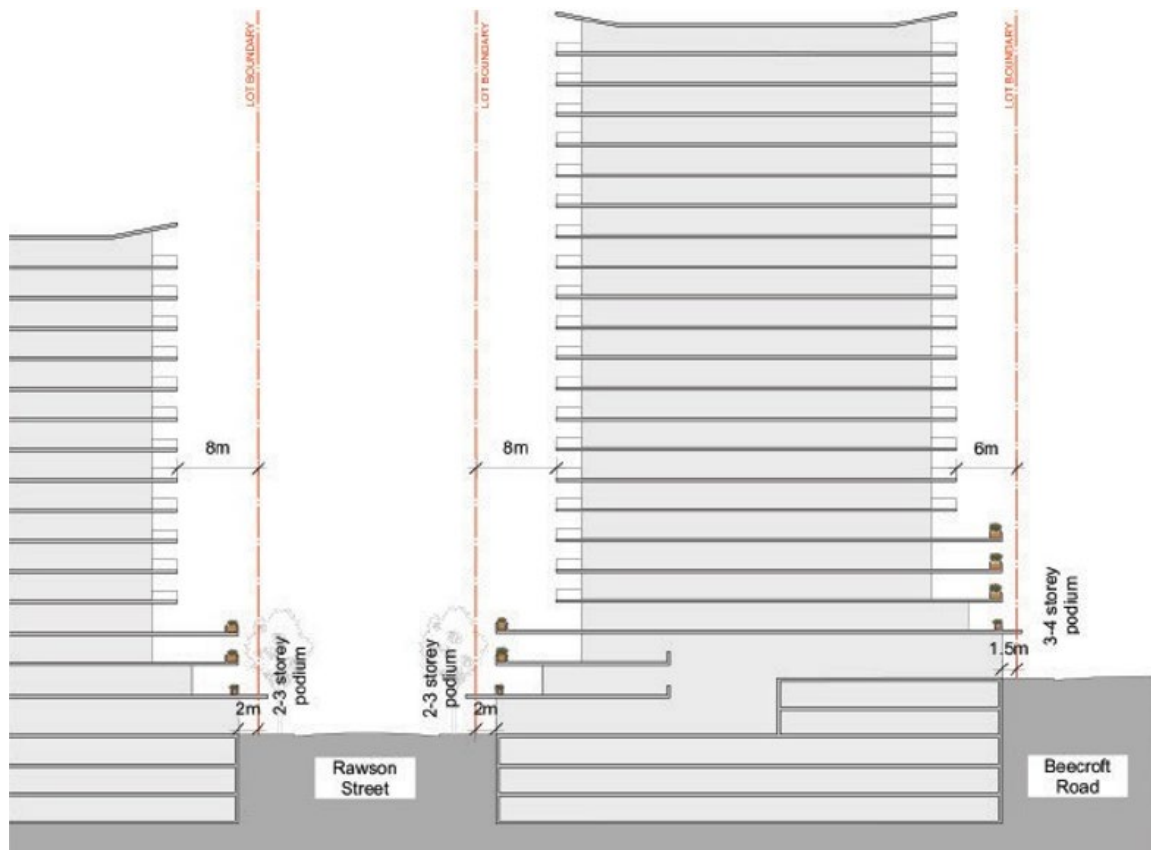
Setbacks to Rawson Street and Beecroft Road
